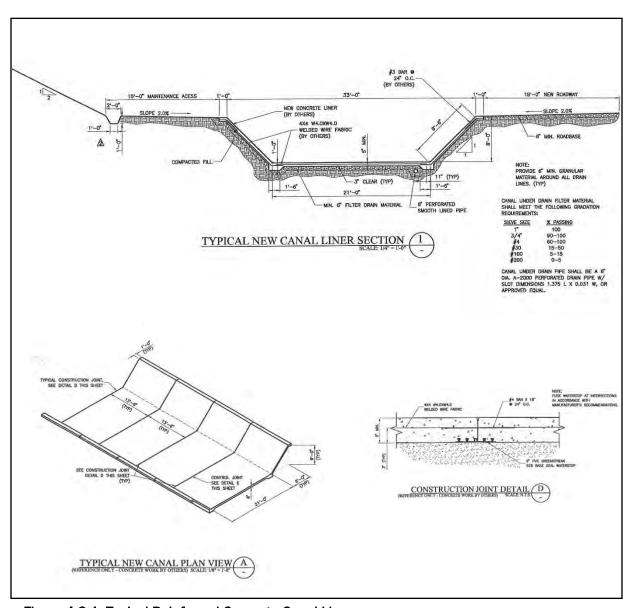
Typical Reinforced Concrete Canal Liner
